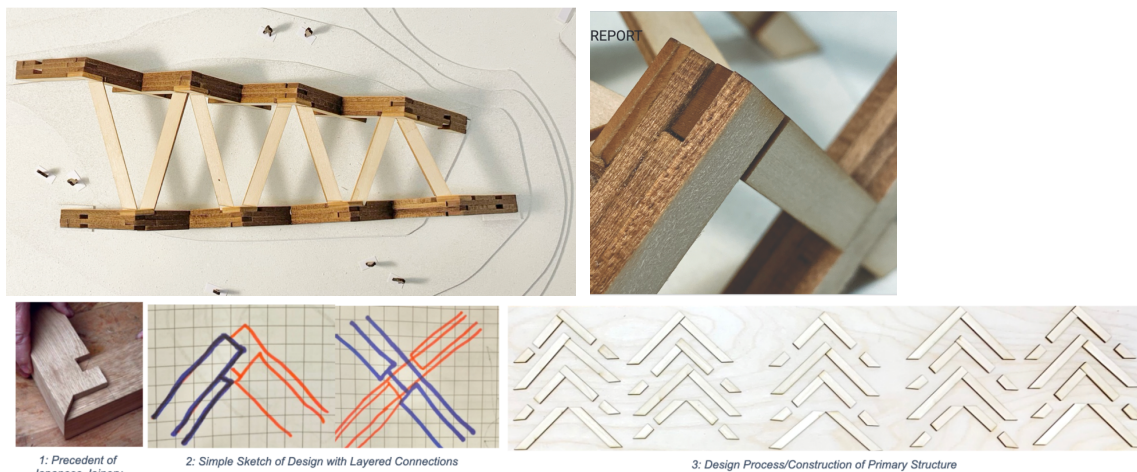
Integrated triangulation of primary systems in plan and elevation achieved with oversize layering for dry jointing and stability through mass and geometry. Contending with the requirement of pinned connections in wood, these students were inspired by Japanese joinery to develop a method of connection. Student work by Remi Messier and Michael Rathz.
